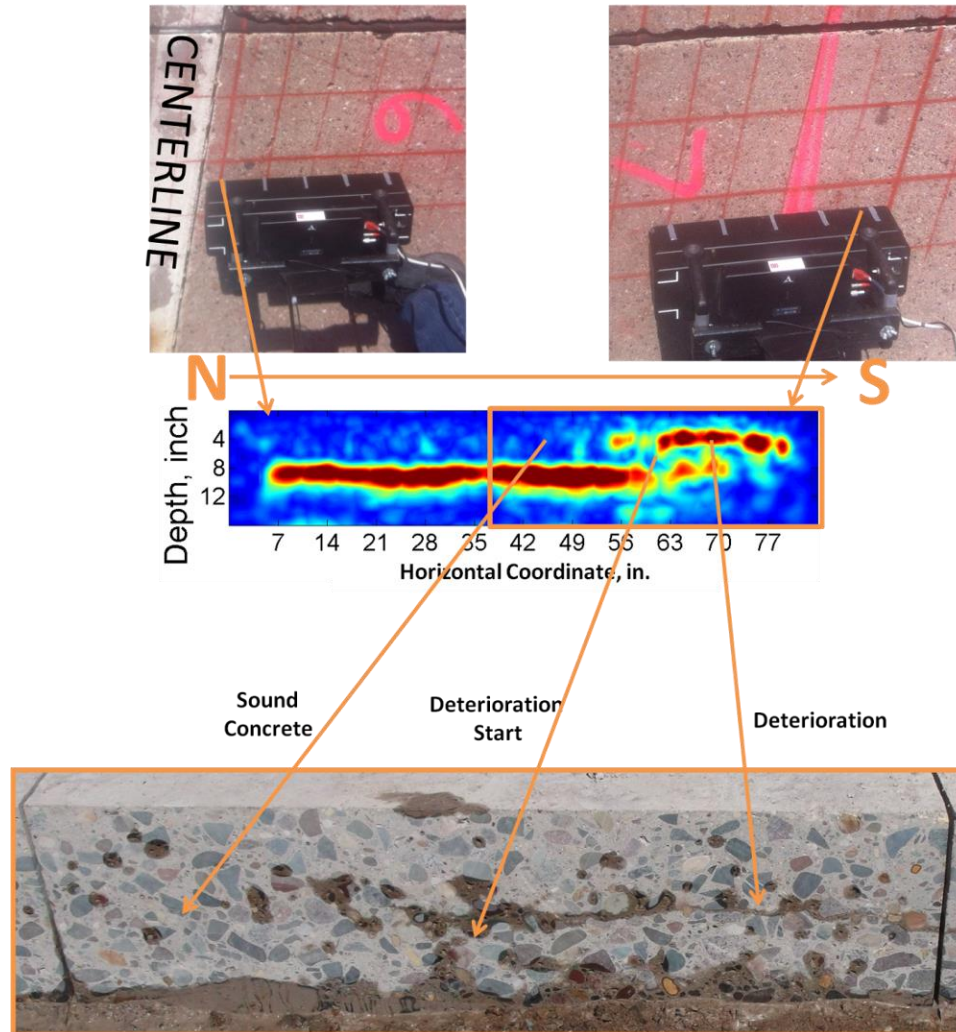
SAFT-Pan reconstruction and comparison with the actual delamination crack path at a MnROAD concrete pavement transverse joint.
